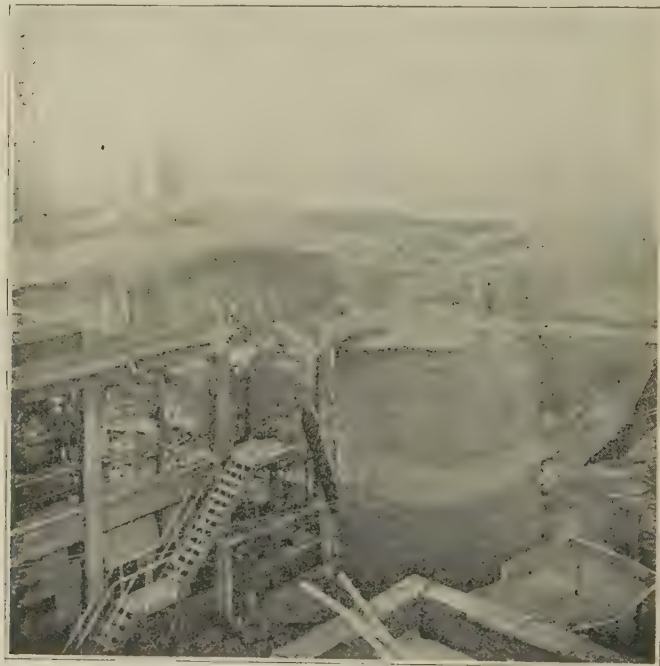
VIEW OF BUILDING NO. 15, OF BARRETT PLANT.
